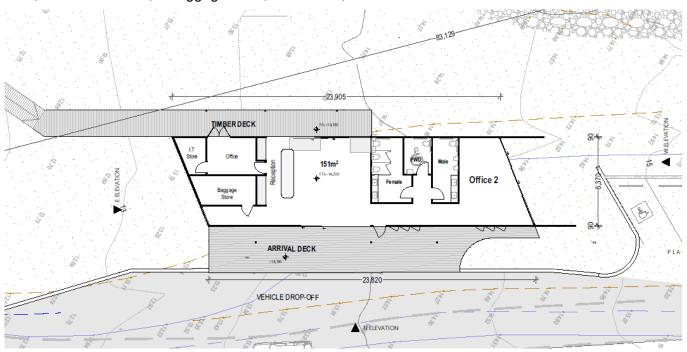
Reception/Administration building (CB.02 - Reception Building, Revision 15, 27/09/2022).
